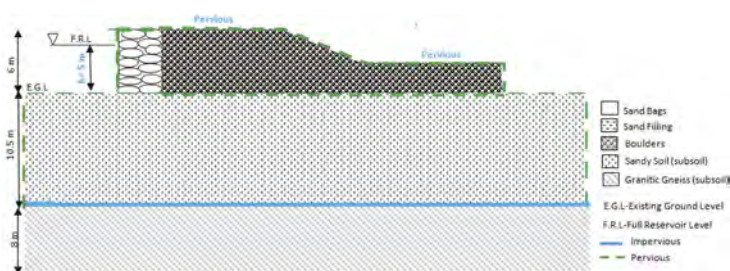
Cross-section of the temporary boulder wall in the breached portion.
